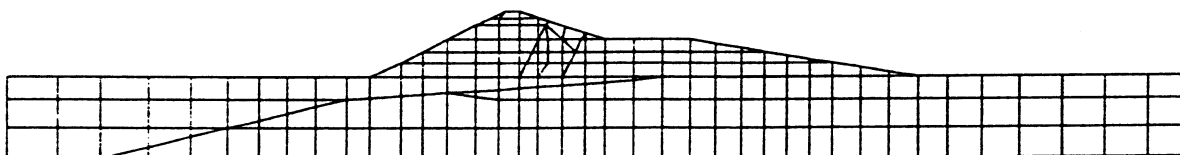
Section of Lukwi Tailings Dam showing finite element mesh
